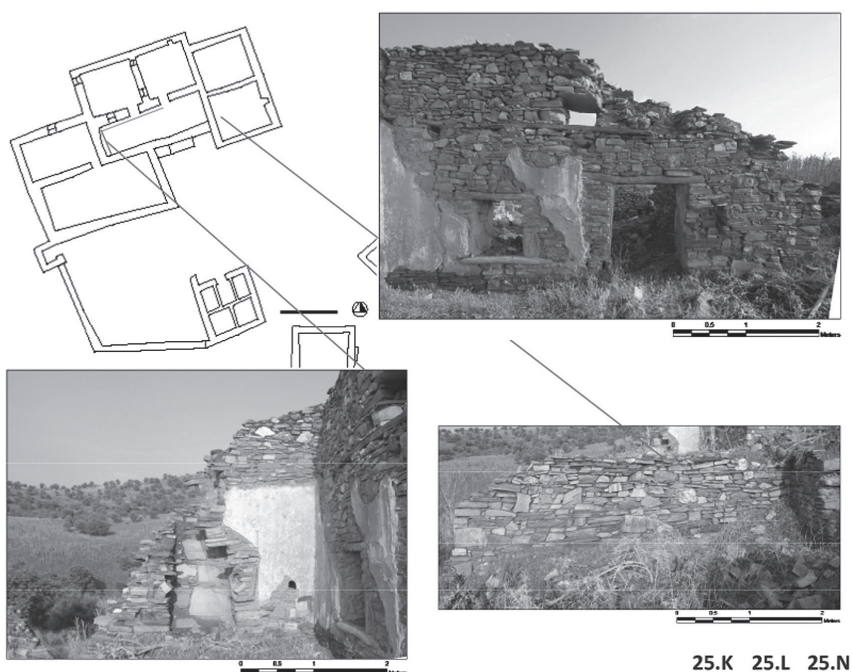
Plan and rectified photograph of wall facade of a structure 25 documented in Eski Haciveliler in 2011, an example of the type of documentation undertaken.
